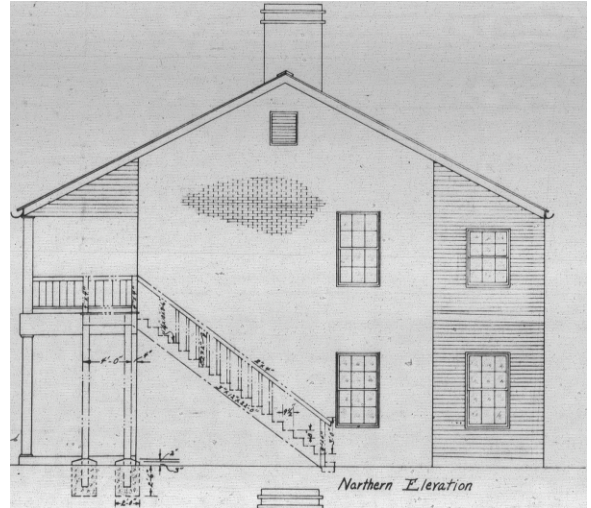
Northern elevation of Keeper's Dwelling from "Repairs & Improvements" to Assistant Keeper's Apartments.
